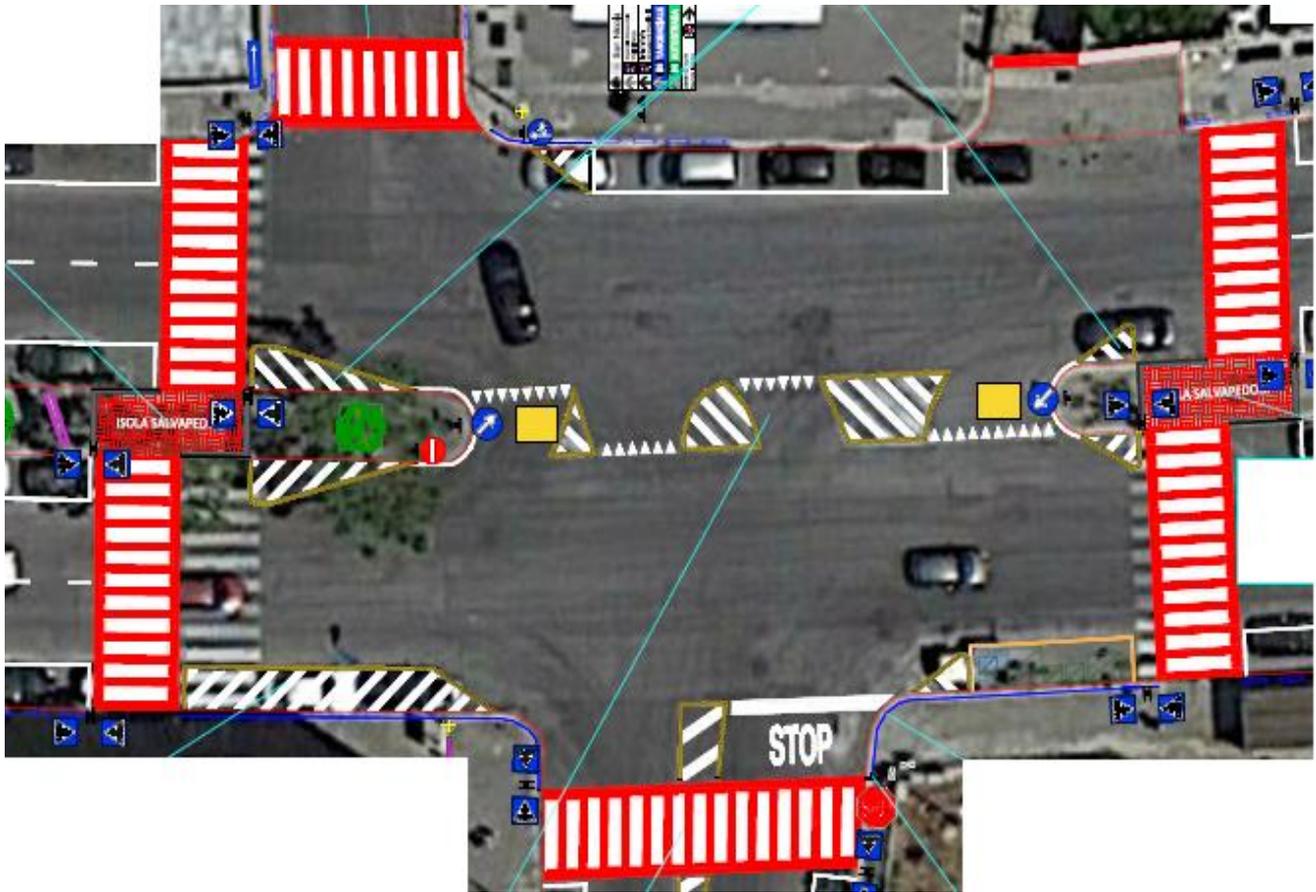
Short-Term countermeasures - Intersection IV.
